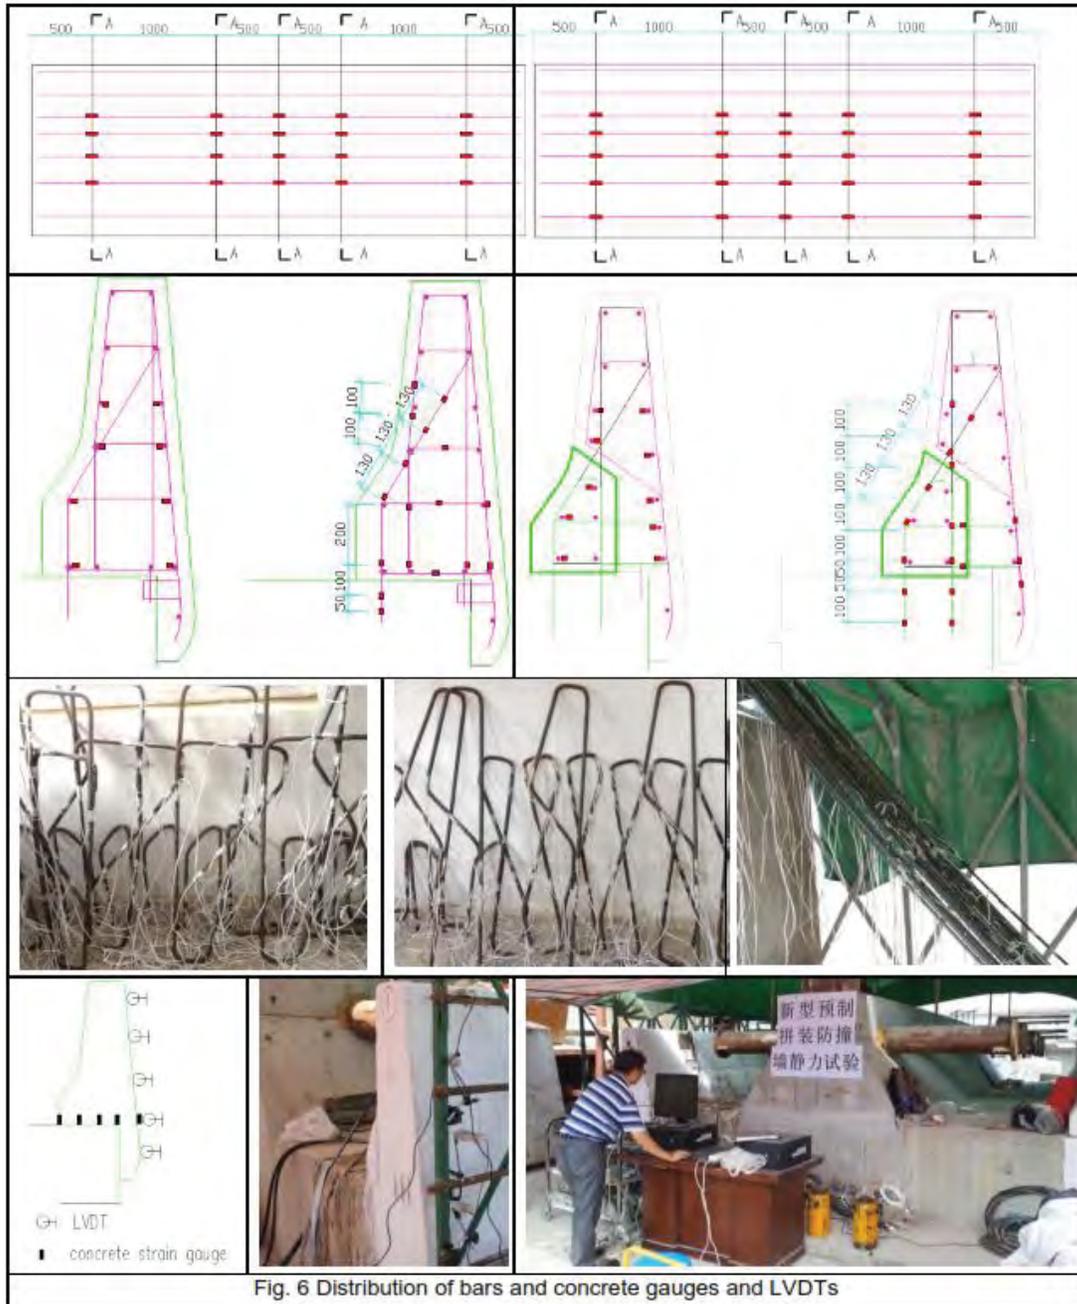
Distribution of bars and concrete gauges and LVDTs
